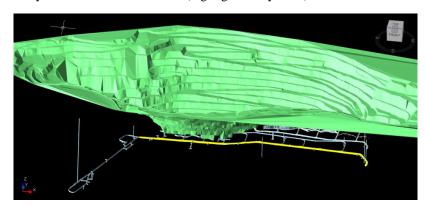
3D model of the Central open pit with interpretation of the haulage roadway at the elevation of +265 m
